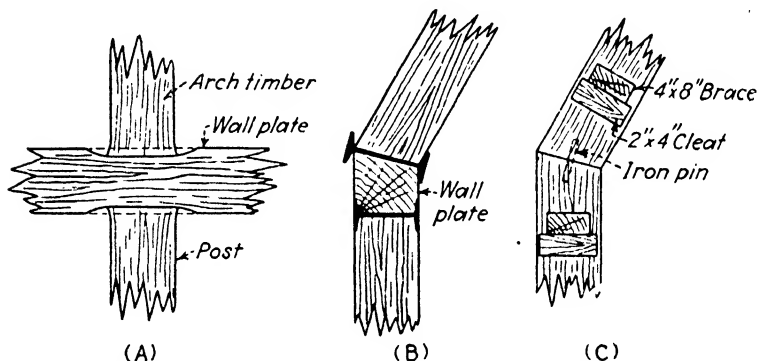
Typical joints between posts and arch timbers. *A*, post and rib in direct bearing on side grain of wall plate, wall plate subject to crushing. *B*, armored wall plate, posts and ribs bear against webs of steel beams. *C*, wall plate eliminated, posts and ribs in direct bearing; dowel pin keeps them from slipping; braces between sets are required to provide longitudinal stability otherwise given by wall plate.
